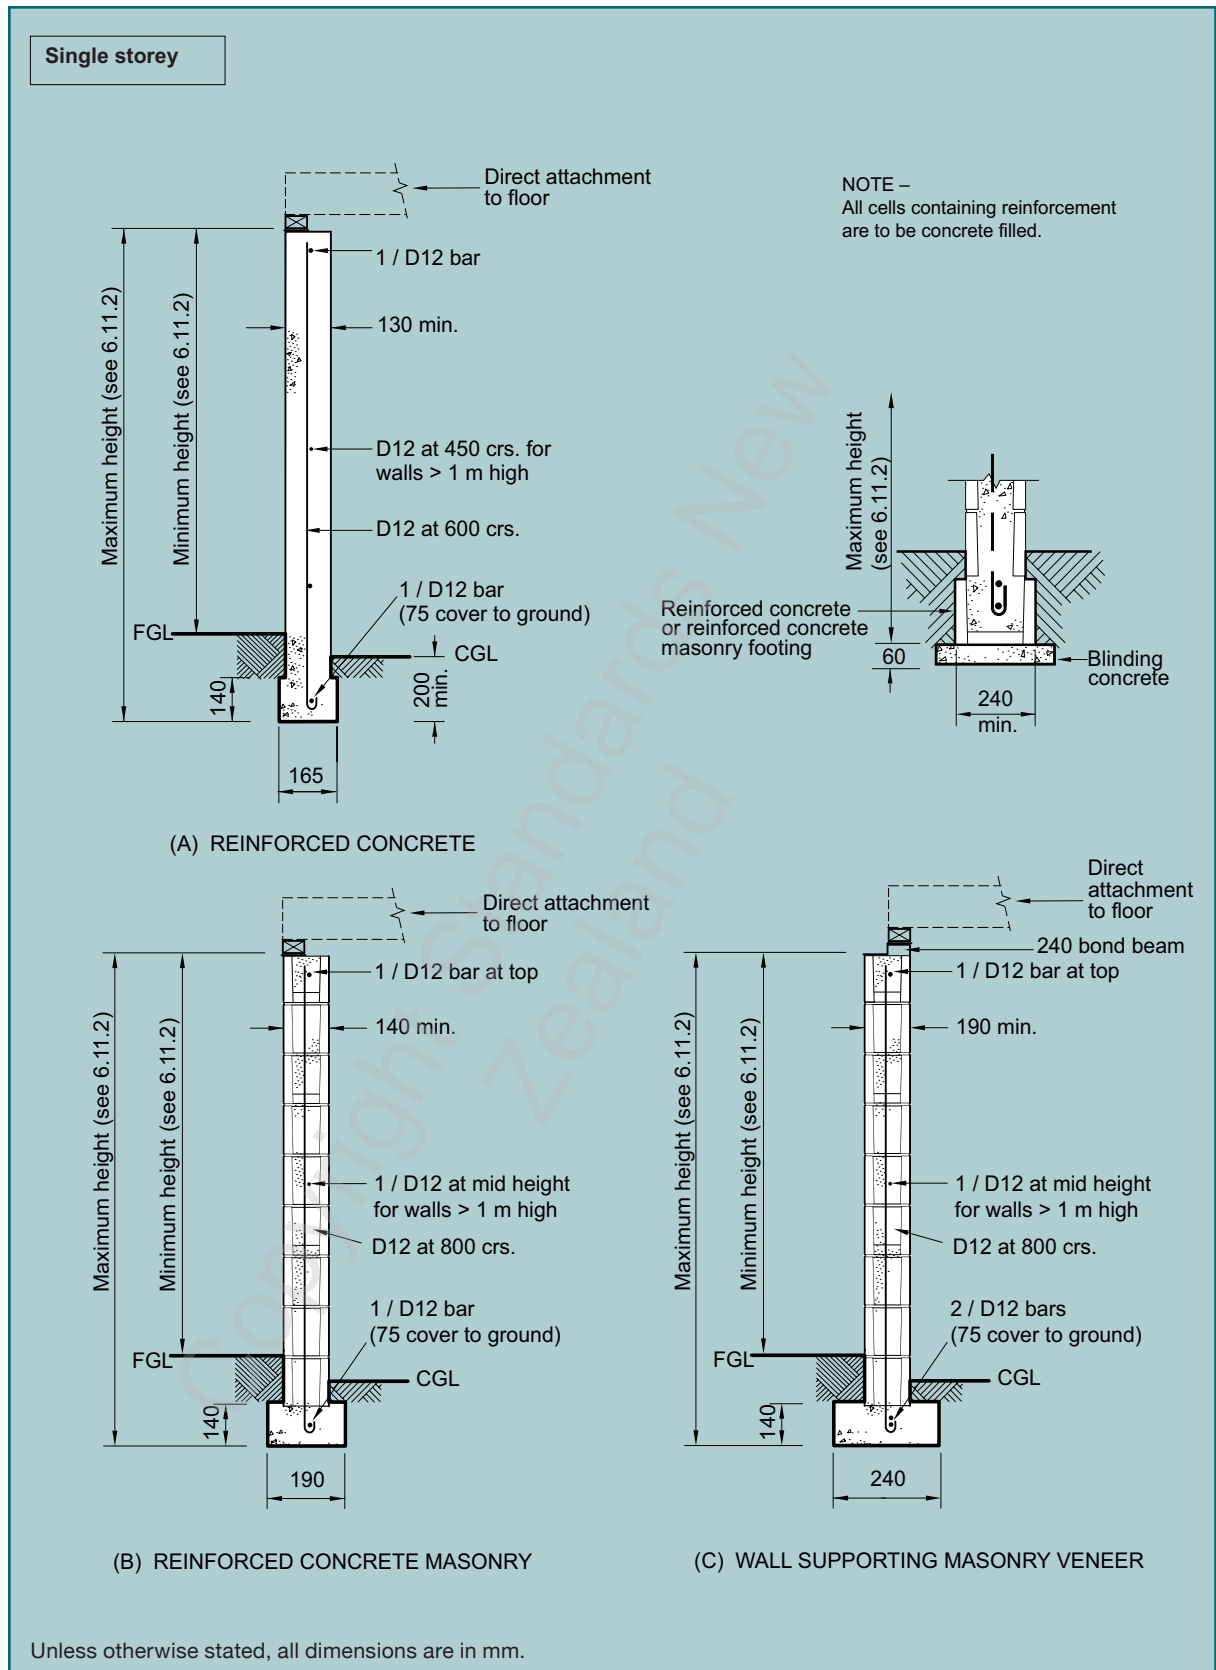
Foundation walls (not cantilevered) for single-storey buildings (see 6.11.3, 6.11.4.2, and 6.11.7.1)
